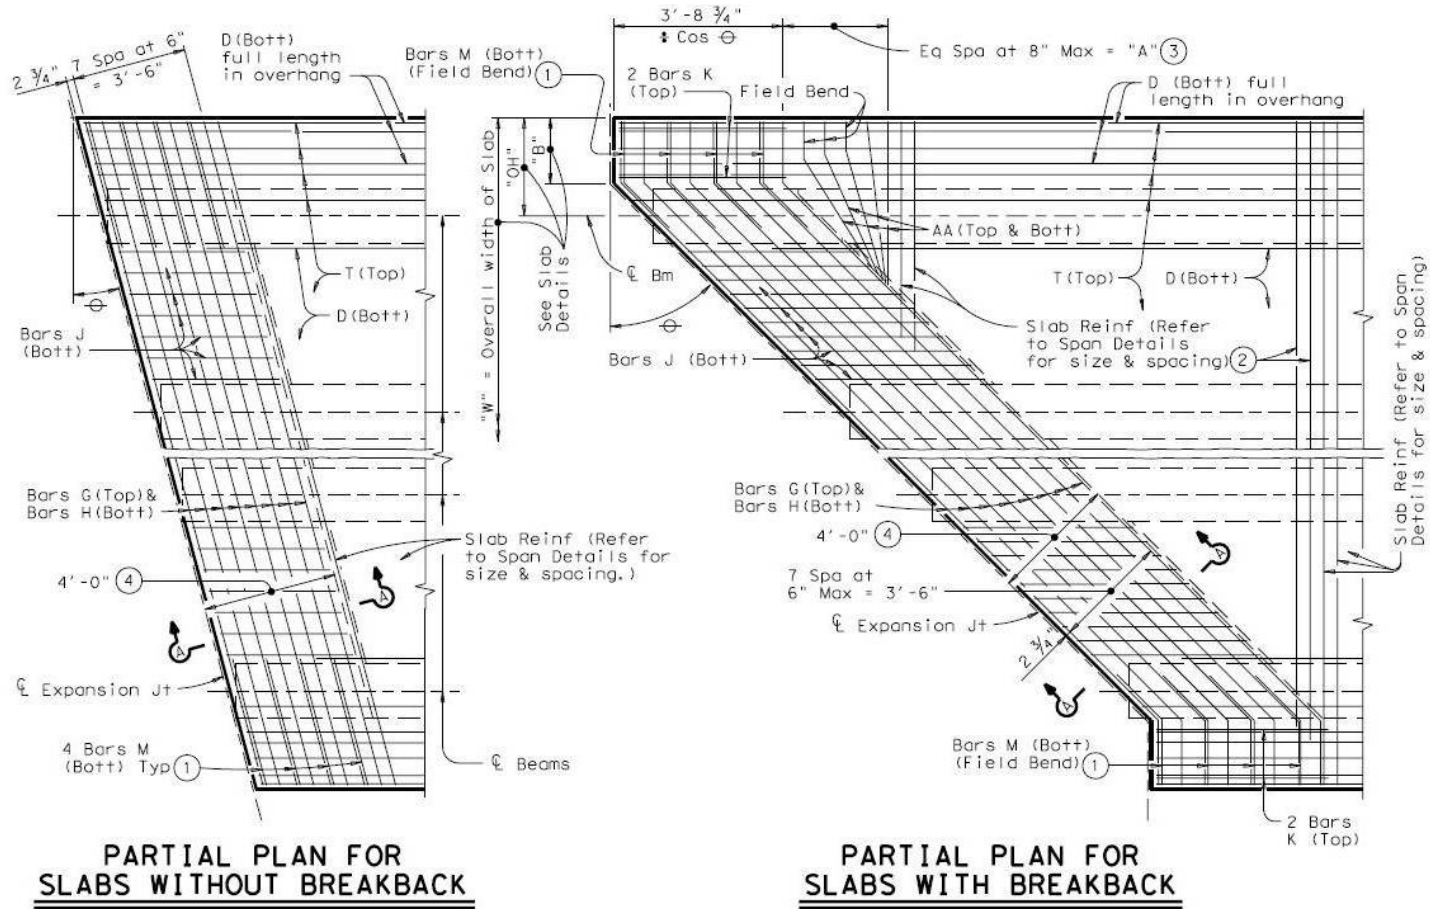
Plan View of IBTS Detail at Expansion Joints (TxDOT)
